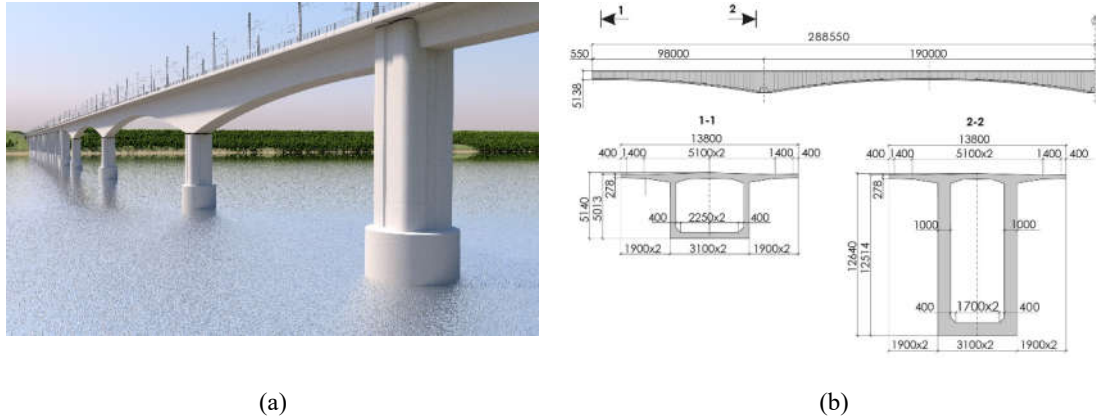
Prestressed concrete solution: (a) photomontage and (b) elevation view and cross-sections
